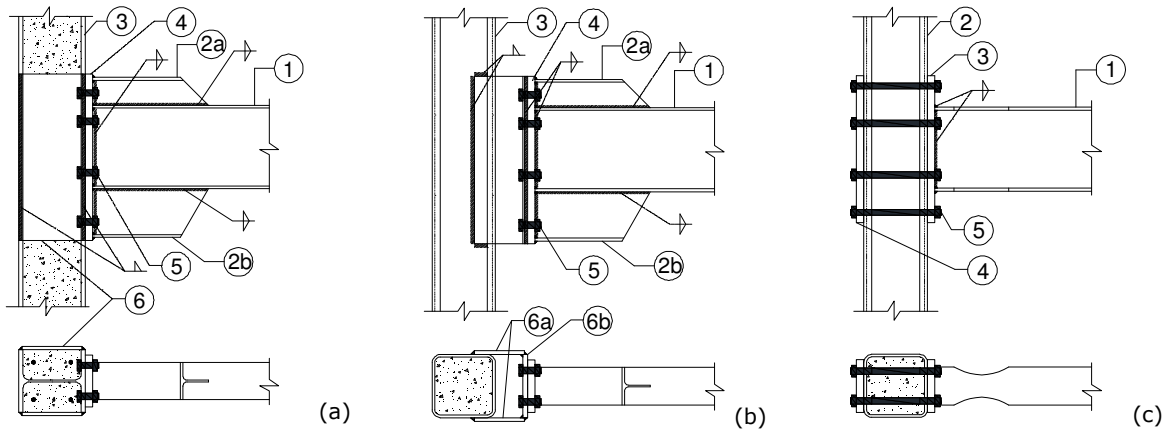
Bolted beam-to-column joints: (a) “joint configuration 1”, (b) “joint configuration 2”, (c) “joint configuration 3”
